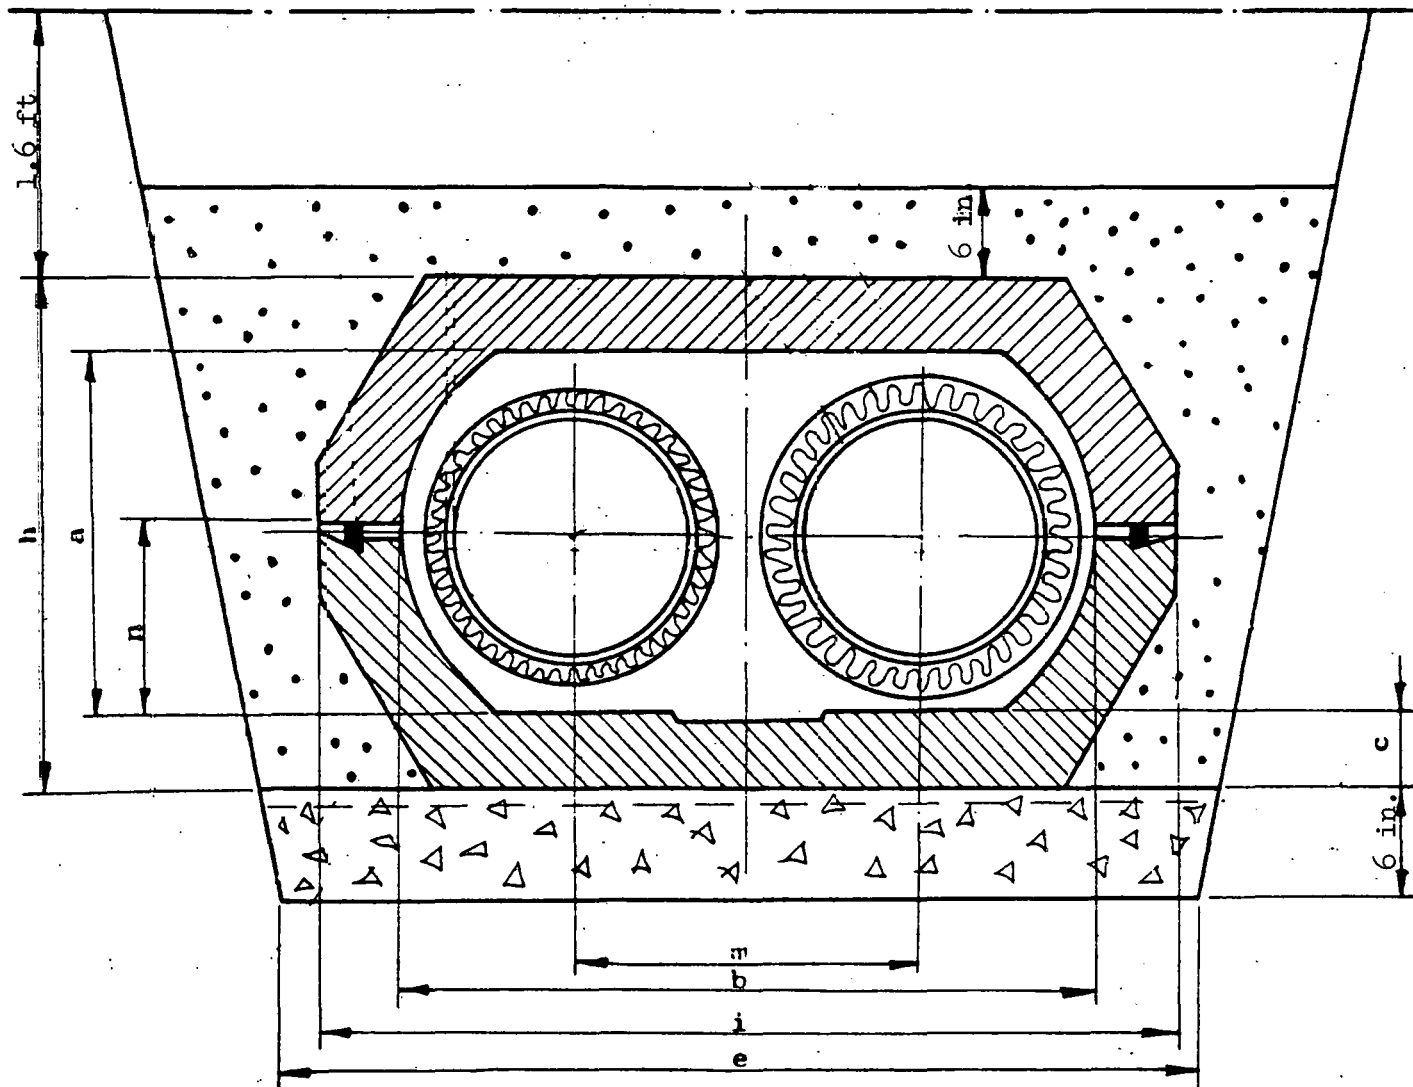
PREFABRICATED CONCRETE CULVERT
